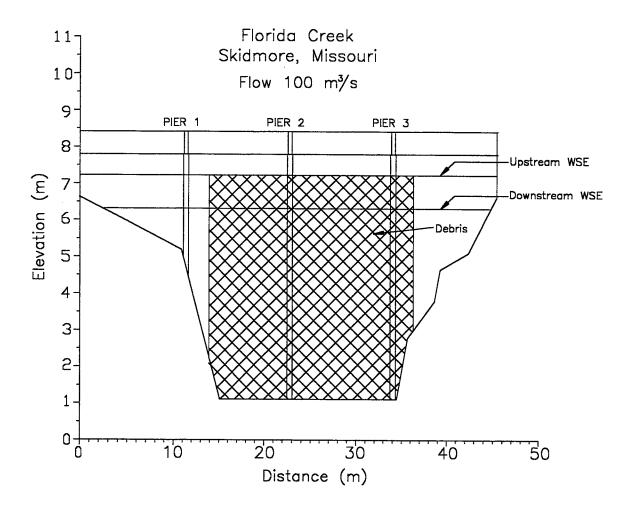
Computed water surface elevations with debris accumulation, Missouri Highway 113 bridge over Florida Creek, near Skidmore, Missouri.
